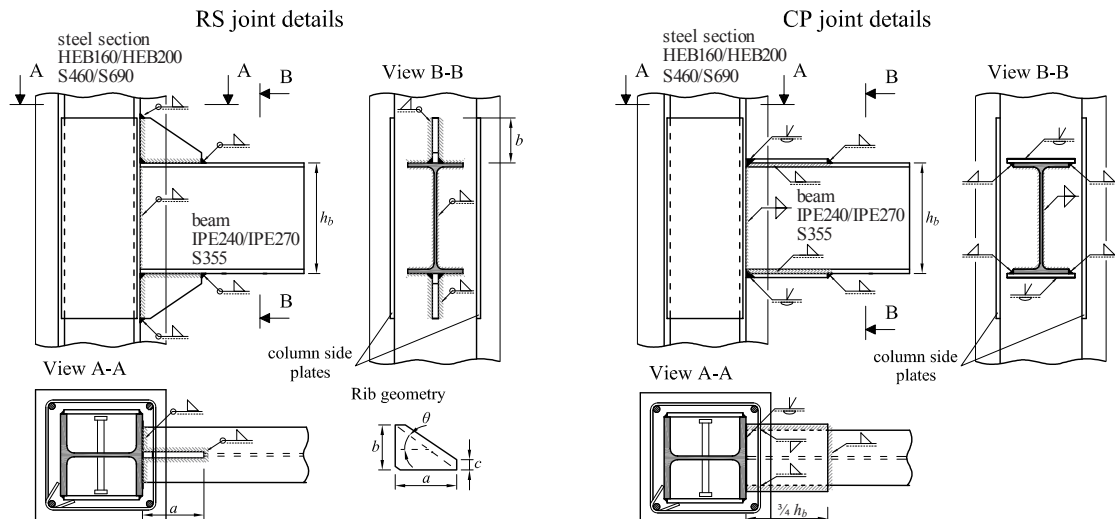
Welded RS and CP beam-to-column joint details (concrete column encasement not illustrated)
